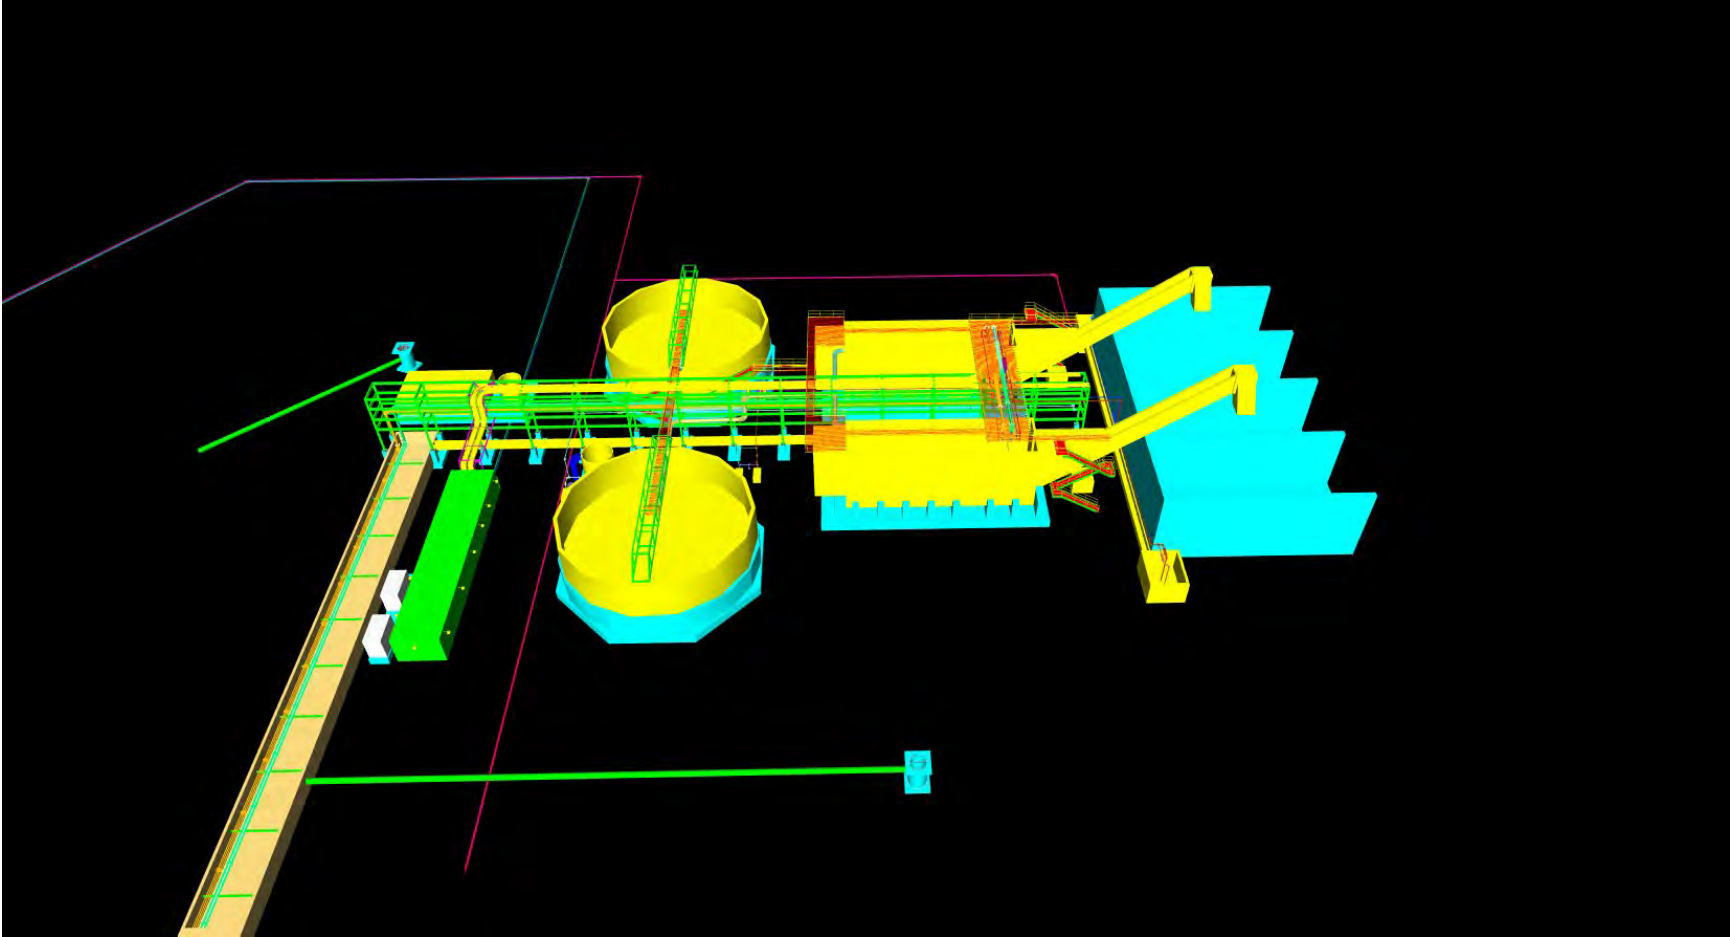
Proposed Dewatering Facility Conceptual Layout
